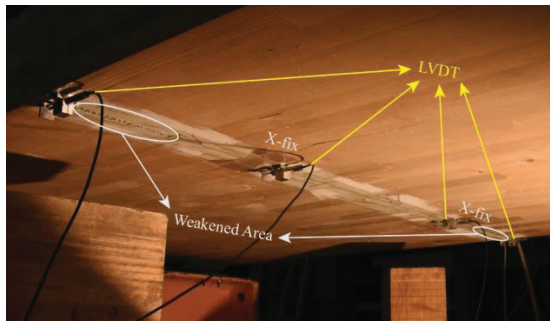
LVDTs mounted at bottom of specimens to measure crack opening
